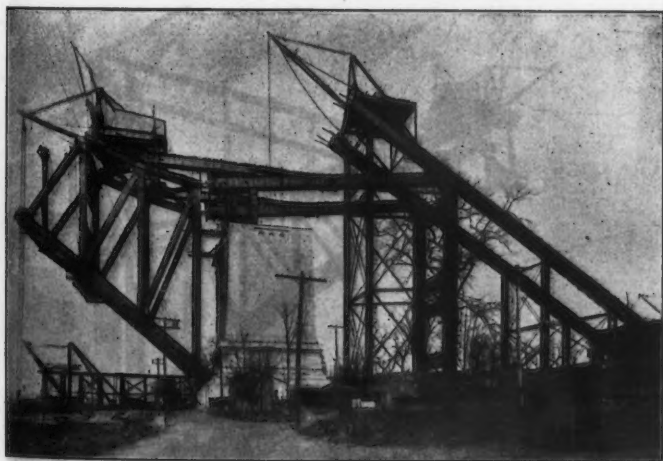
HELL GATE BRIDGE: ERECTION STAGE, APRIL 1ST, 1915, LONG ISLAND SIDE.
